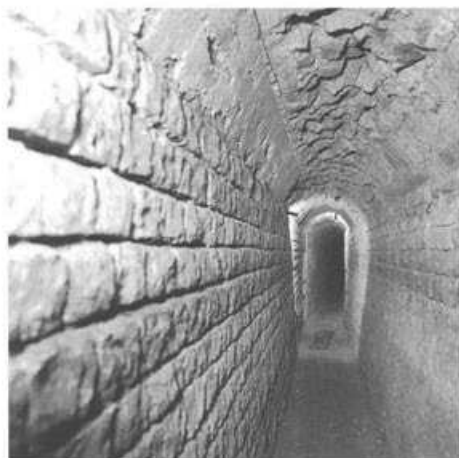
View into the underground sewers 38. This is a drainage tunnel, almost 100 meters long and passable, which drained the central baths into the Violenbach stream (fig 1.35–39). Note the careful masonry of the walls and the imprint of planks in the vaulting.
